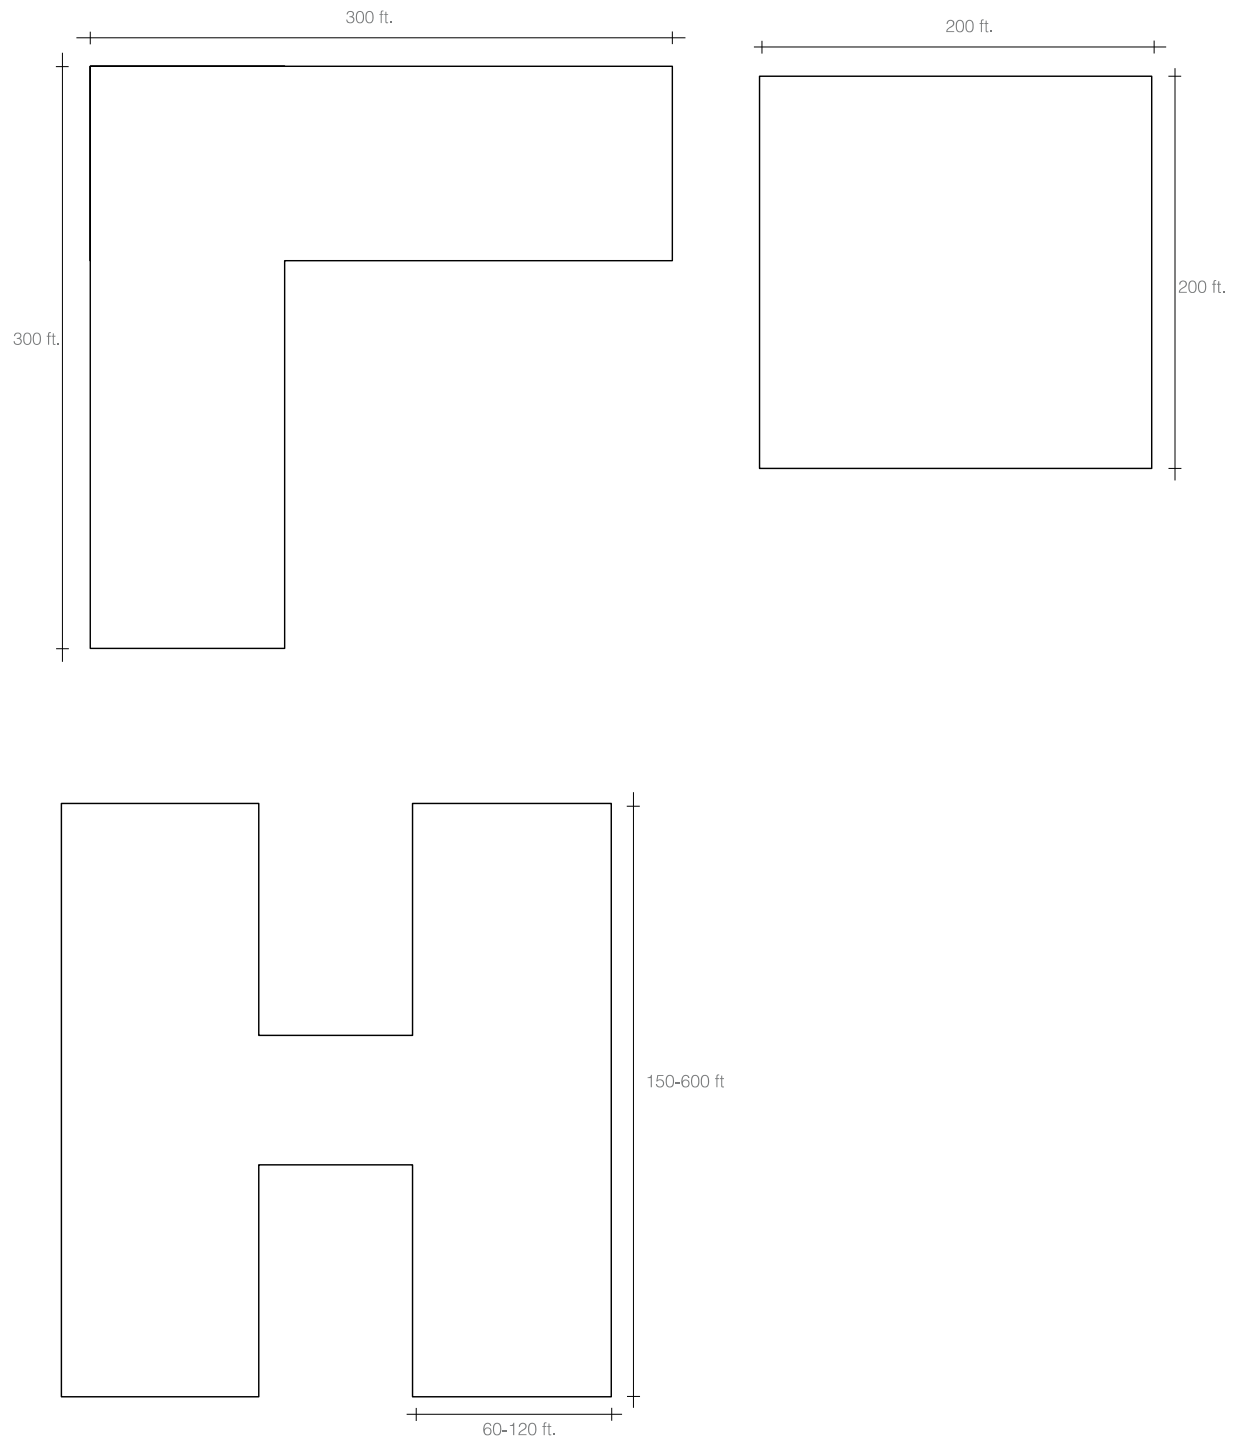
Typical Campus Building Geometries. Typically 60-120' bars ranging around 300 feet in length.
